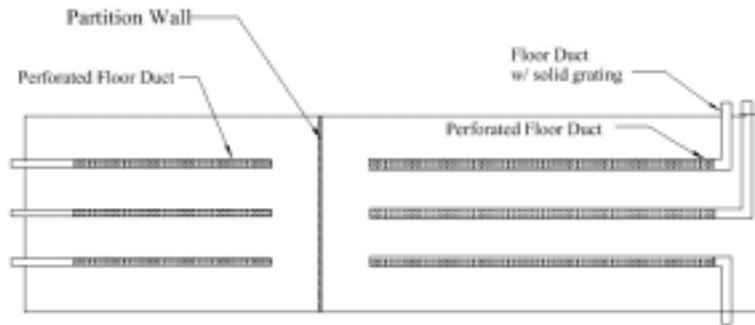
Typical farmer stock peanut warehouse with aeration floor plan.
